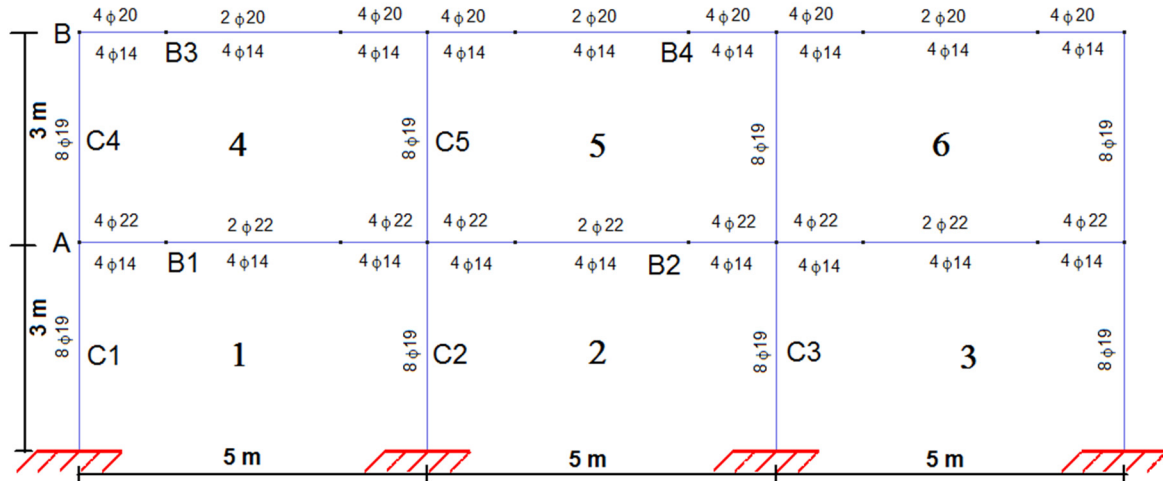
Display of the frame geometry, support conditions, reinforcement and numeration of: beams, columns, joints and bays
